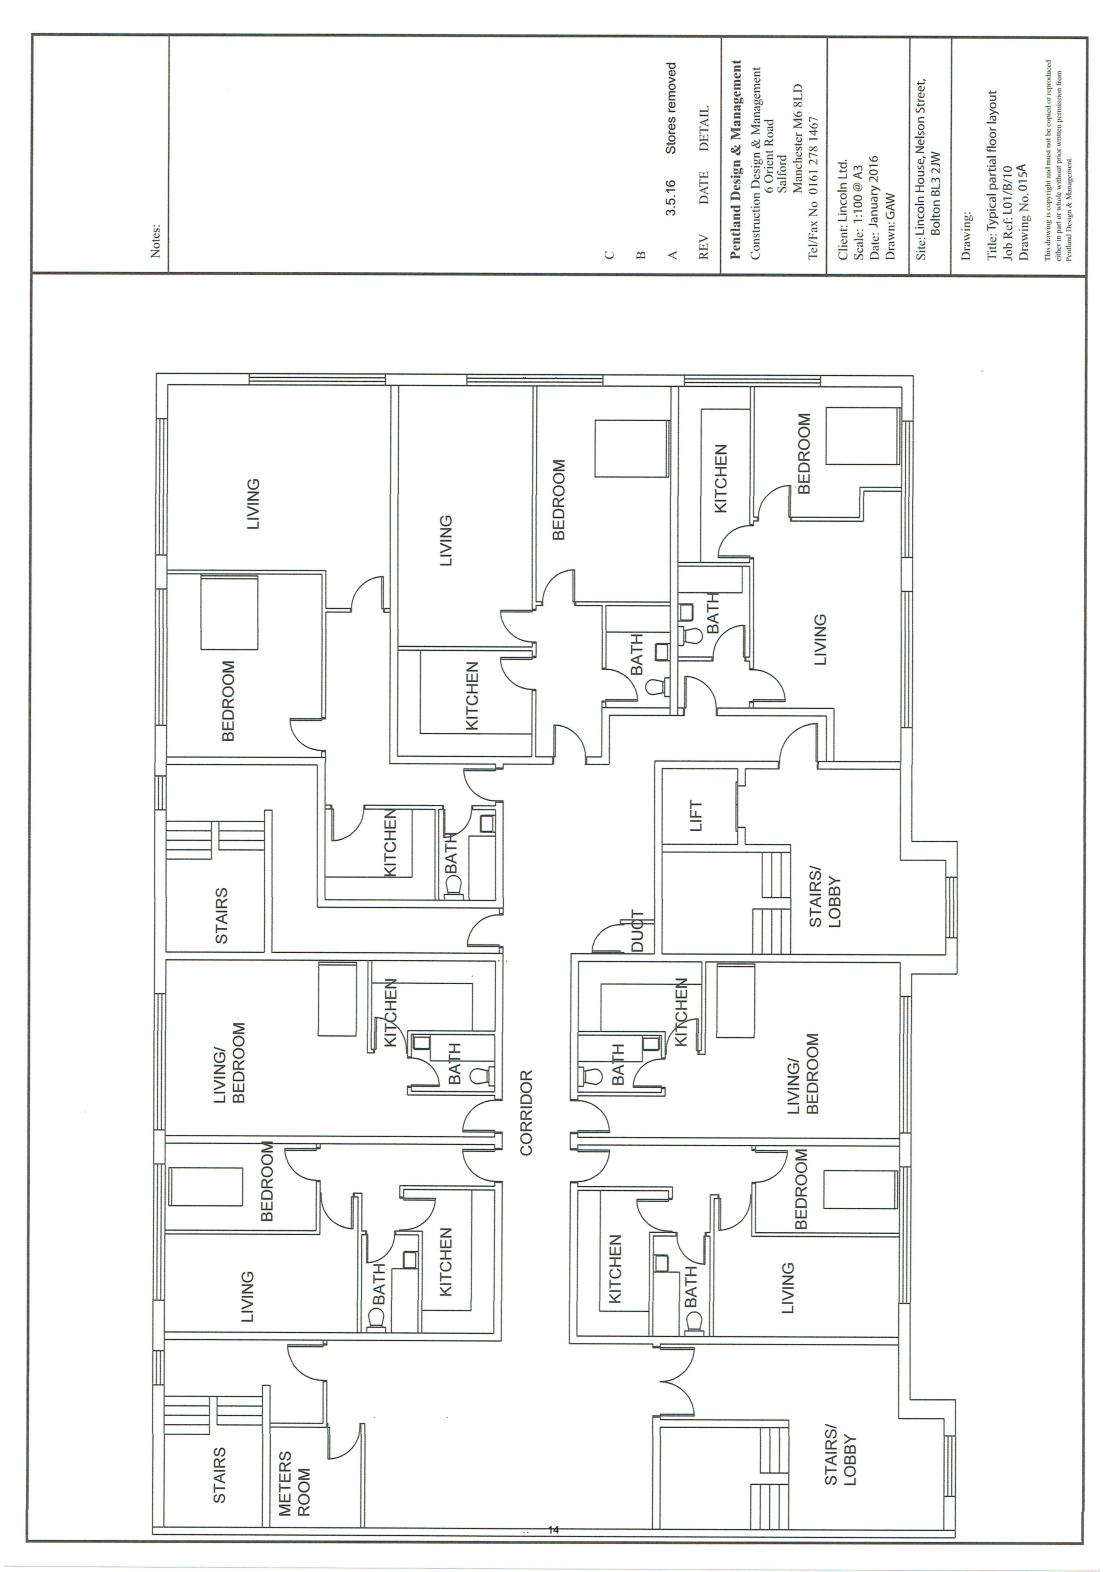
Typical Part Floor Layout Drawing 016 - Proposed Site Layout amendment.
